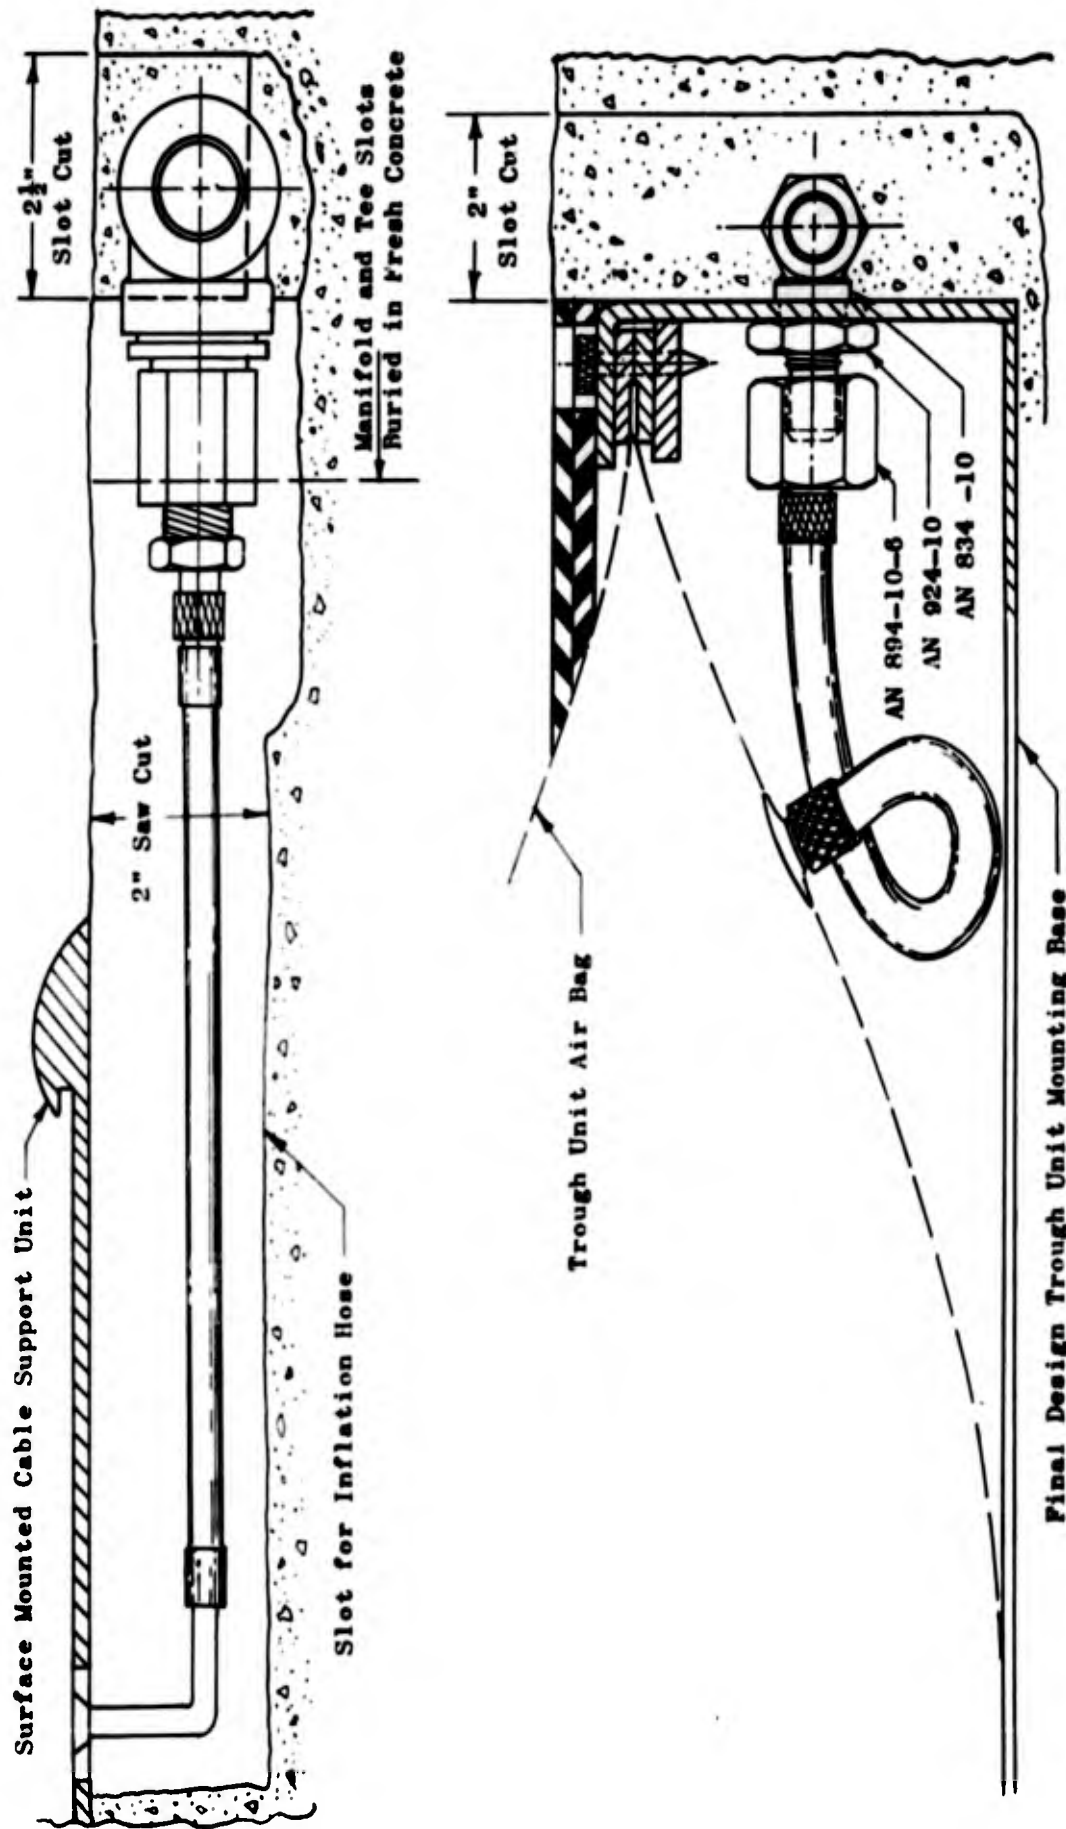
IMPROVED INSTALLATION OF MOUNTING BASE
